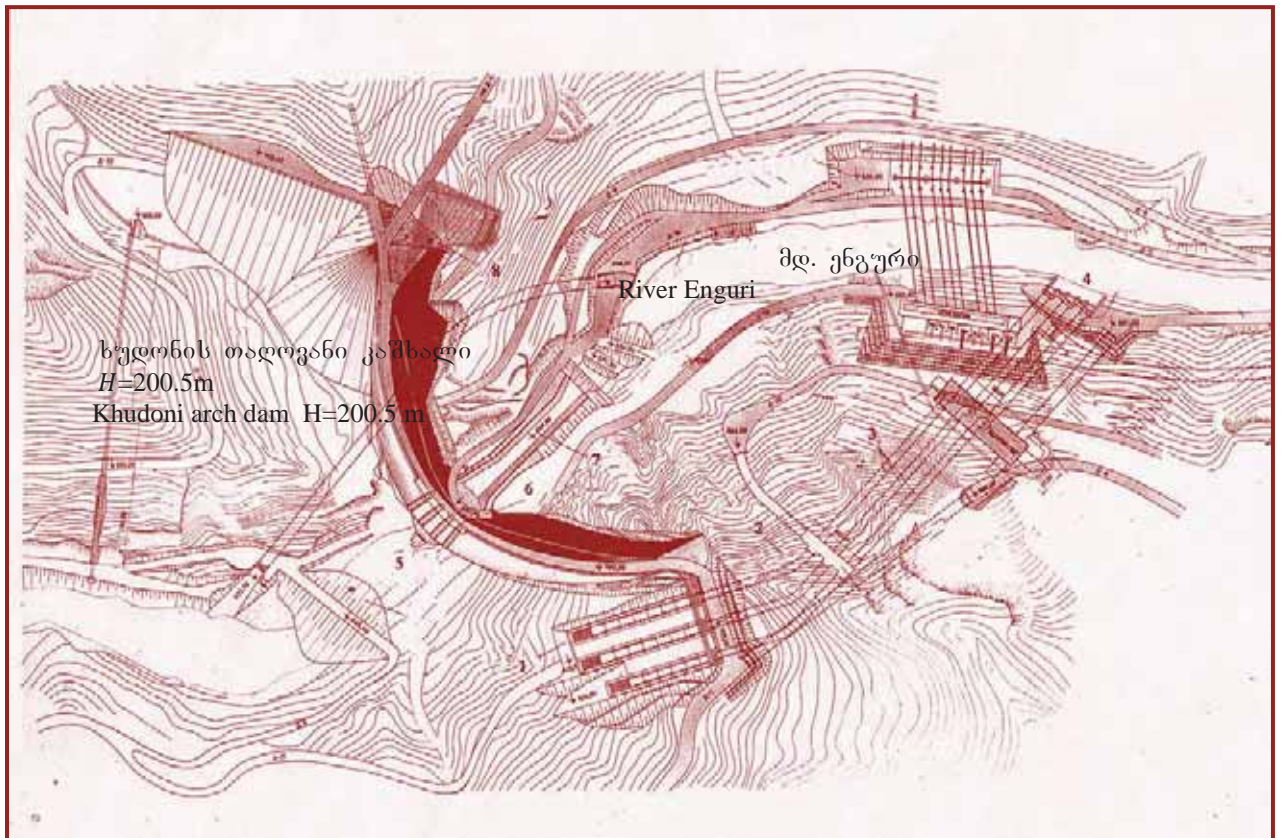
Plan of Khudoni hydraulic project. The main hydraulic structures: 1- intakes 2- head race tunnels 3- pressure shafts 4- tail race tunnels 5- bottom outlets 6-crest (surface) spillway 7- absorption well (sump) 8-left bank spillway
